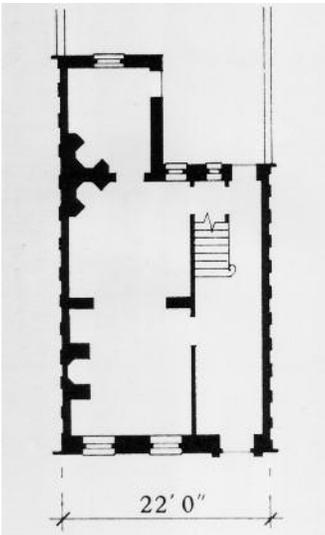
Ground plan of no.13, Upper Brook Street, London, built in 1728 (demolished). *Crown copyright (NMR).
